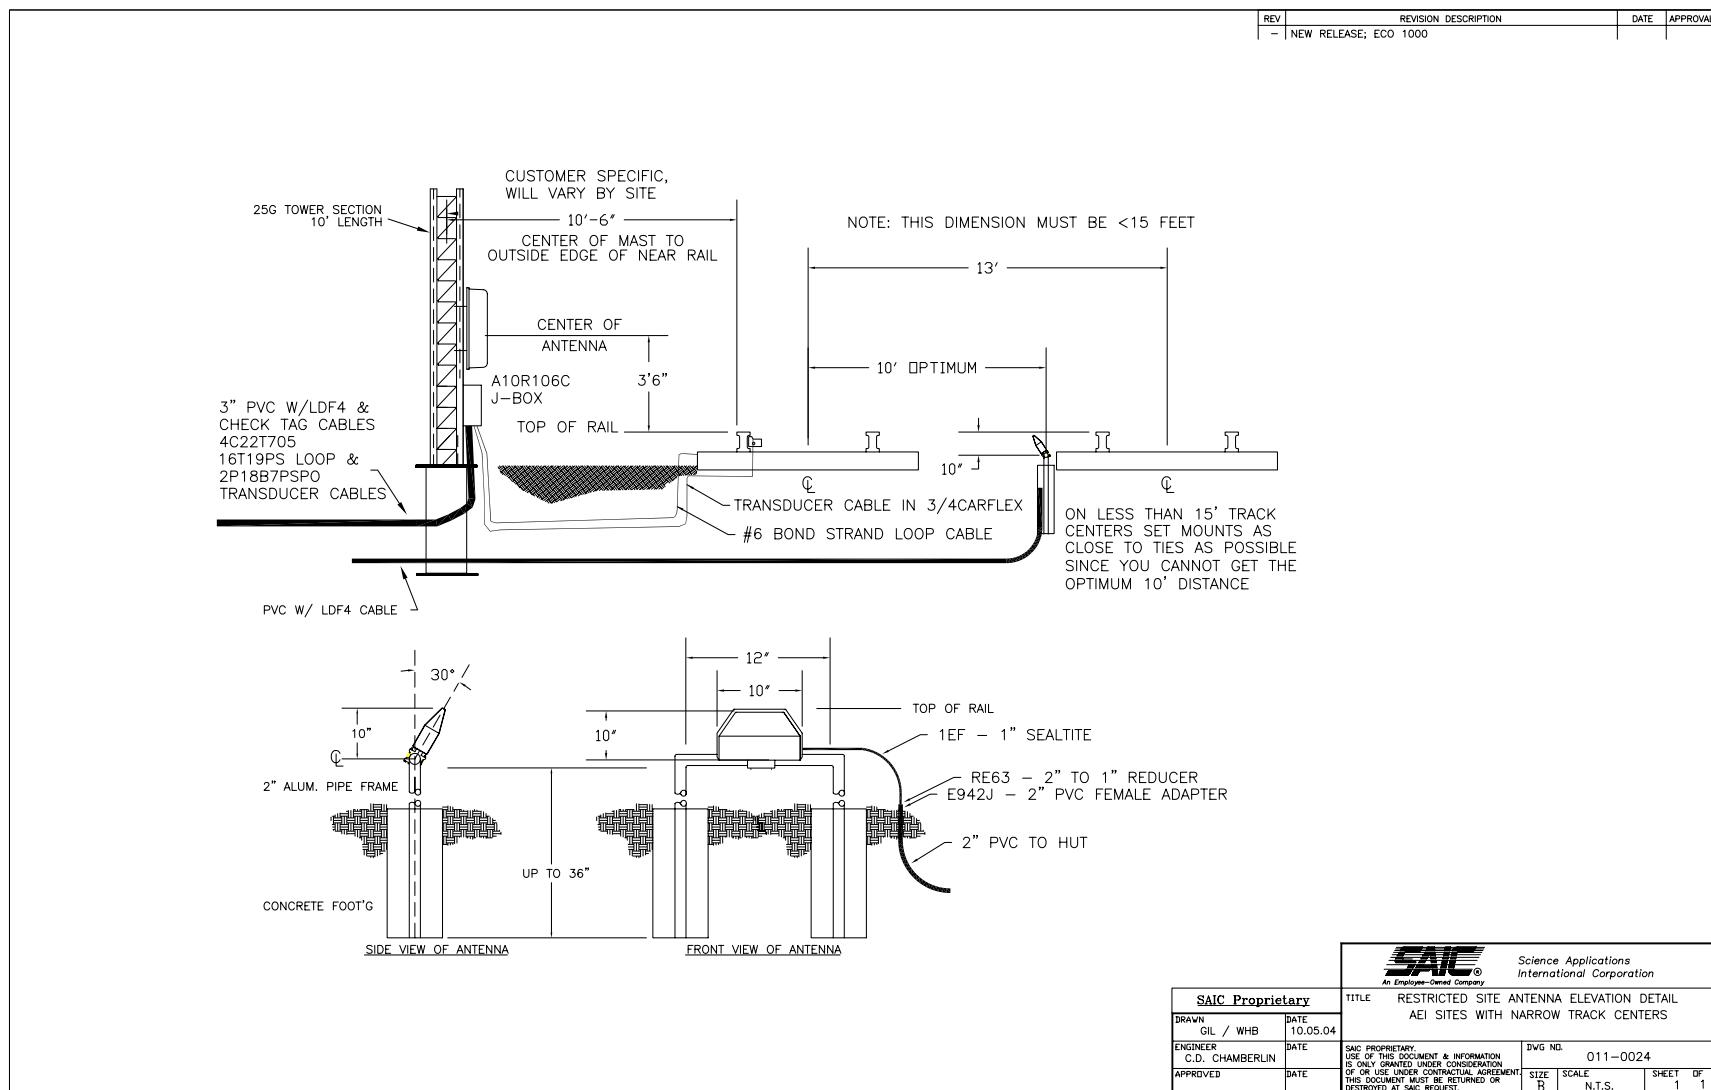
DLR/DMR Antenna Elevation Detail w/Conduit Detail (Narrow Track Centers)
